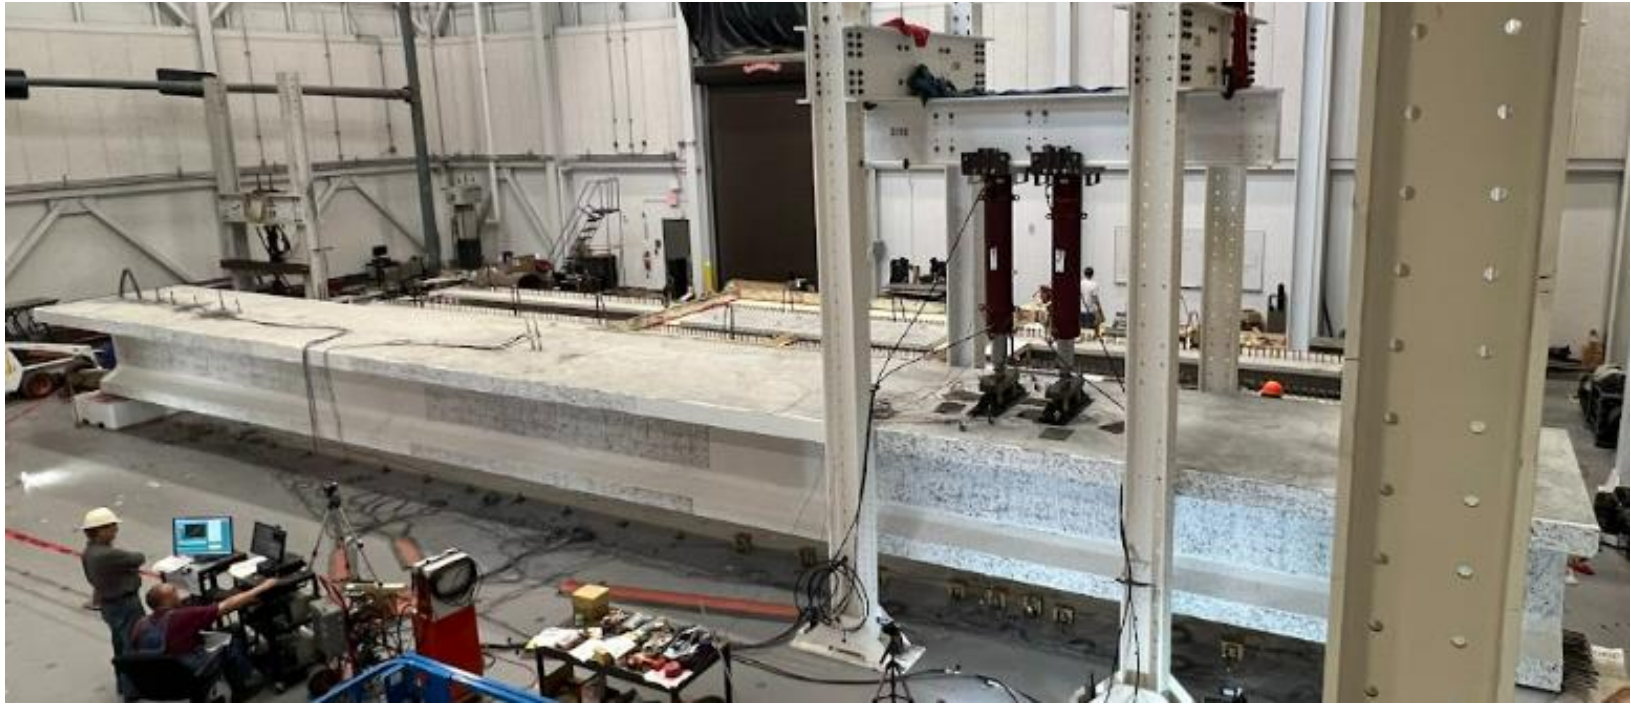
Tx54 Test Setup and Instrumentation for Shear Test 2 (North Face, Load at Unreinforced End).
